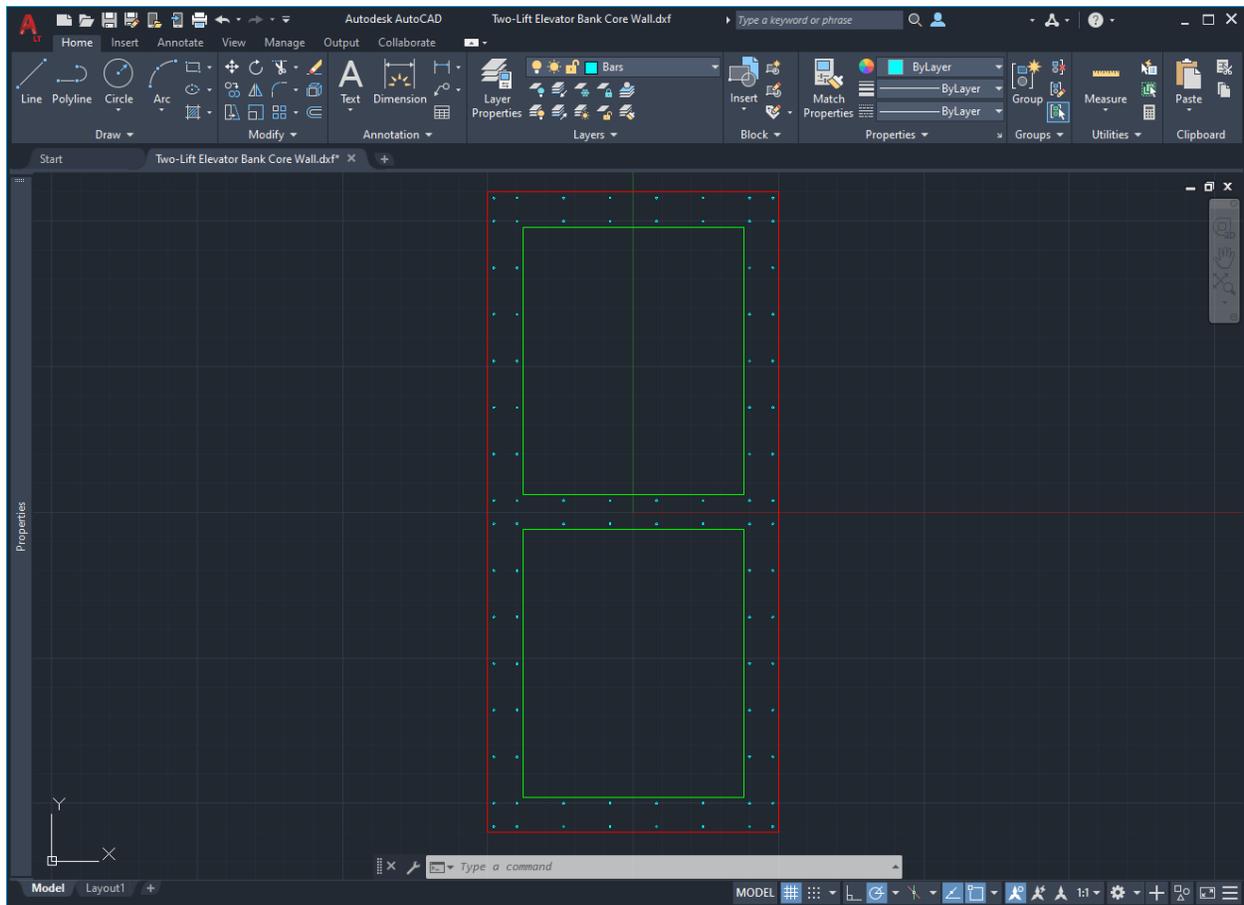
Core wall Section Using AutoCad (.dxf file)
